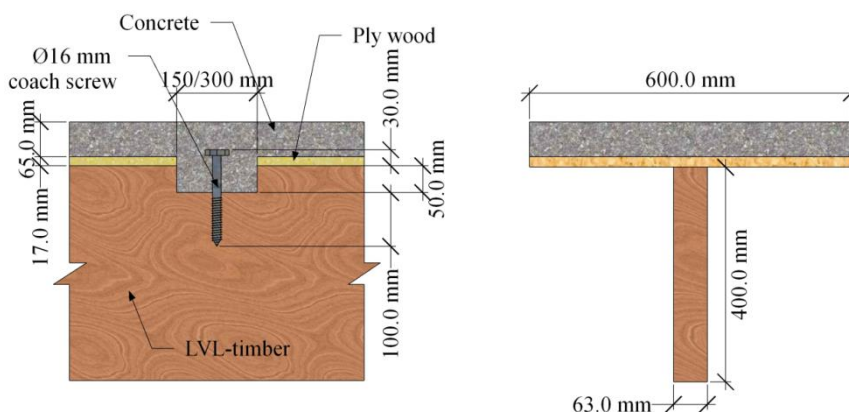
Cross-section and connection details. After Yeoh *et al* [28].
